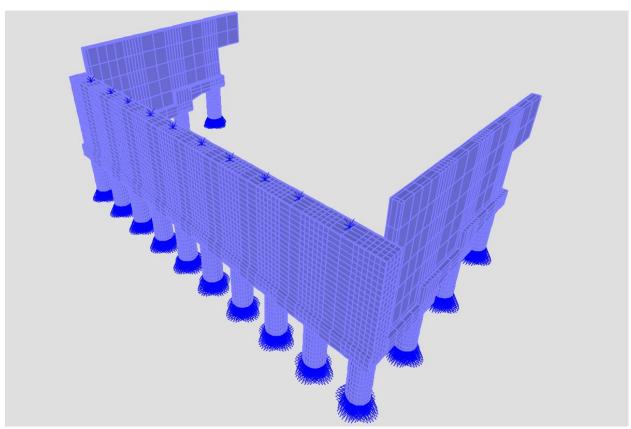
SAP2000 Finite Element Model of HAM-74-1466 bridge abutment.
